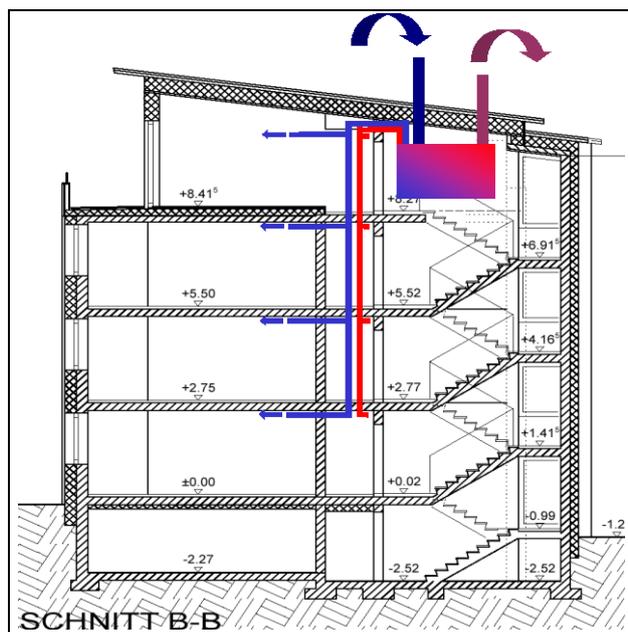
Ventilation plan cross section: ventilation equipment on the top floor
